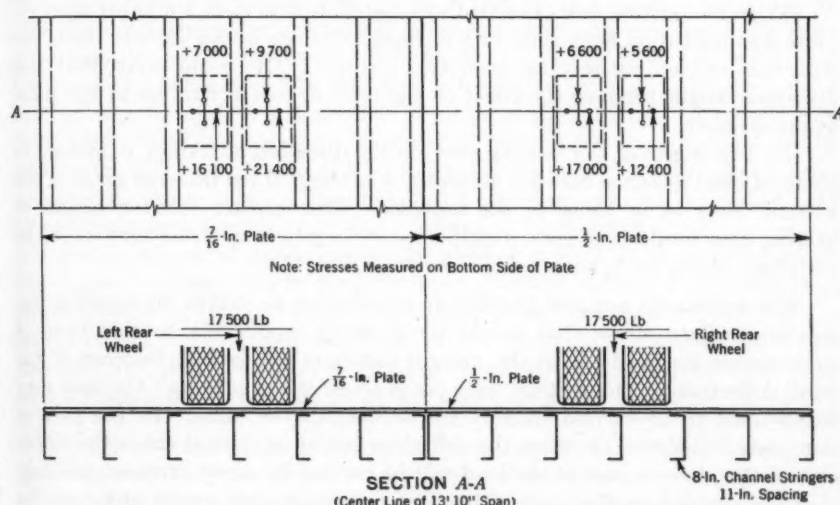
MEASURED STRESSES IN PLATES OF BATTLE-DECK BRIDGE FLOOR
